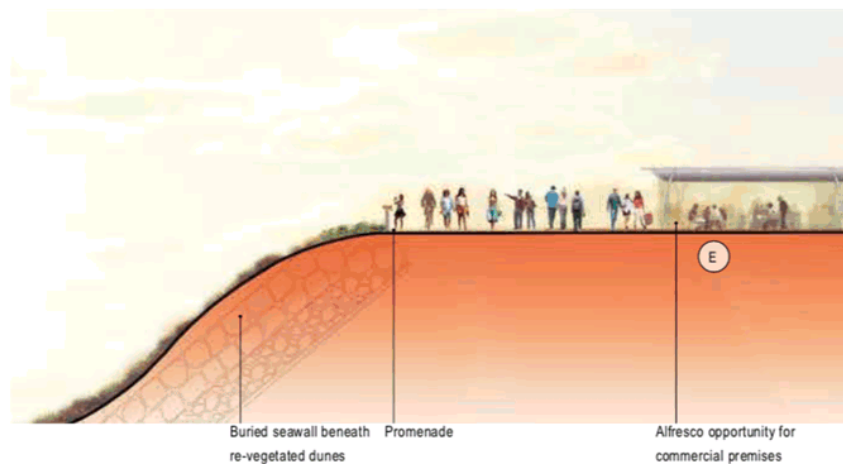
Typical Section showing High Crested Buried Revetment in Masterplan
